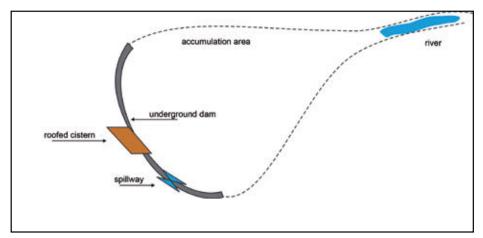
CPATSA Underground Dam Source: Costa Duarte (1998).
